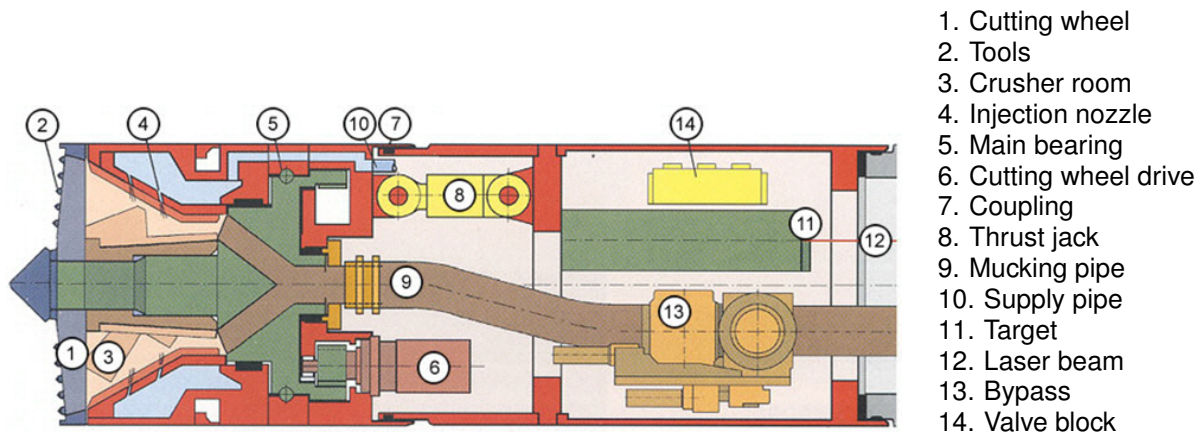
Principle of a hydraulic mucking boring machine (source: Herrenknecht AG (2013a))
